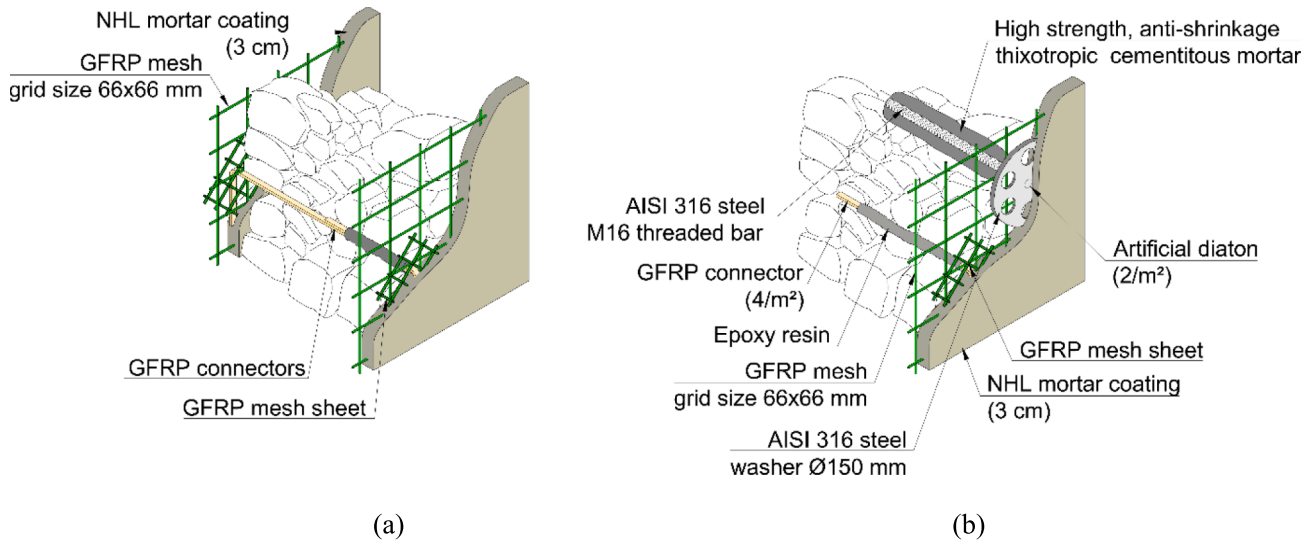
CRM strengthening system – (a) two-sided and (b) one-sided strengthening.
